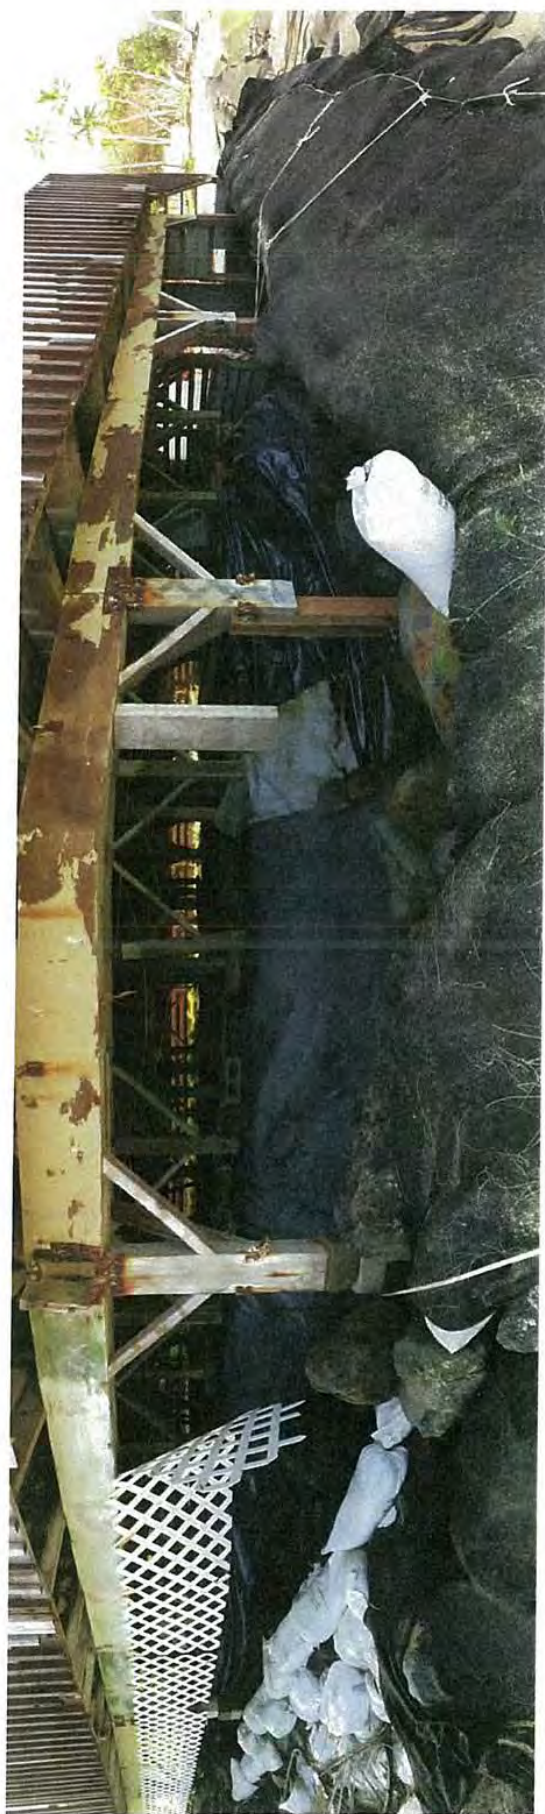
OCCL Staff Photo Taken 12/16/2021
